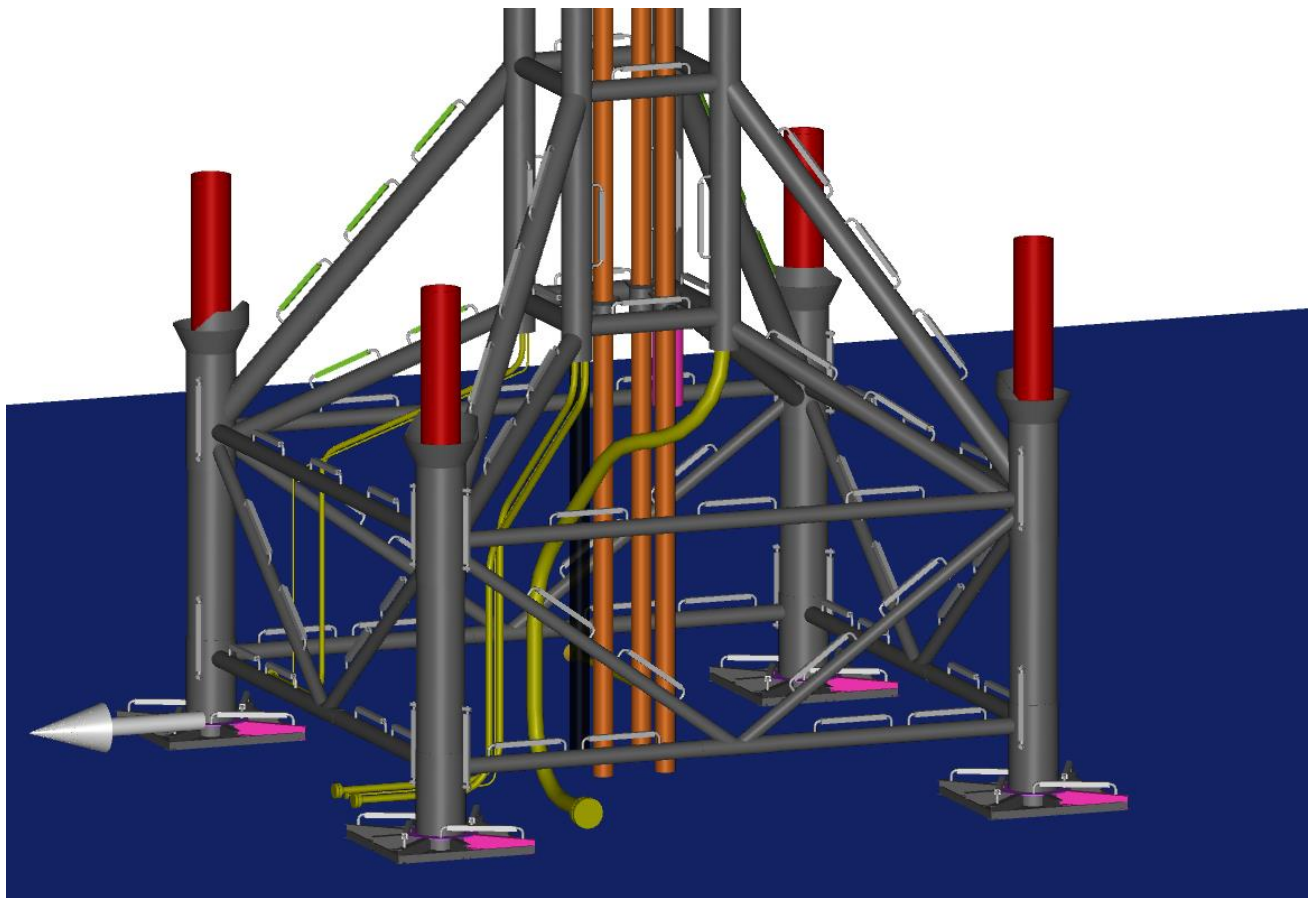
Indicative schematic of the footings and piles. North arrow shown.
